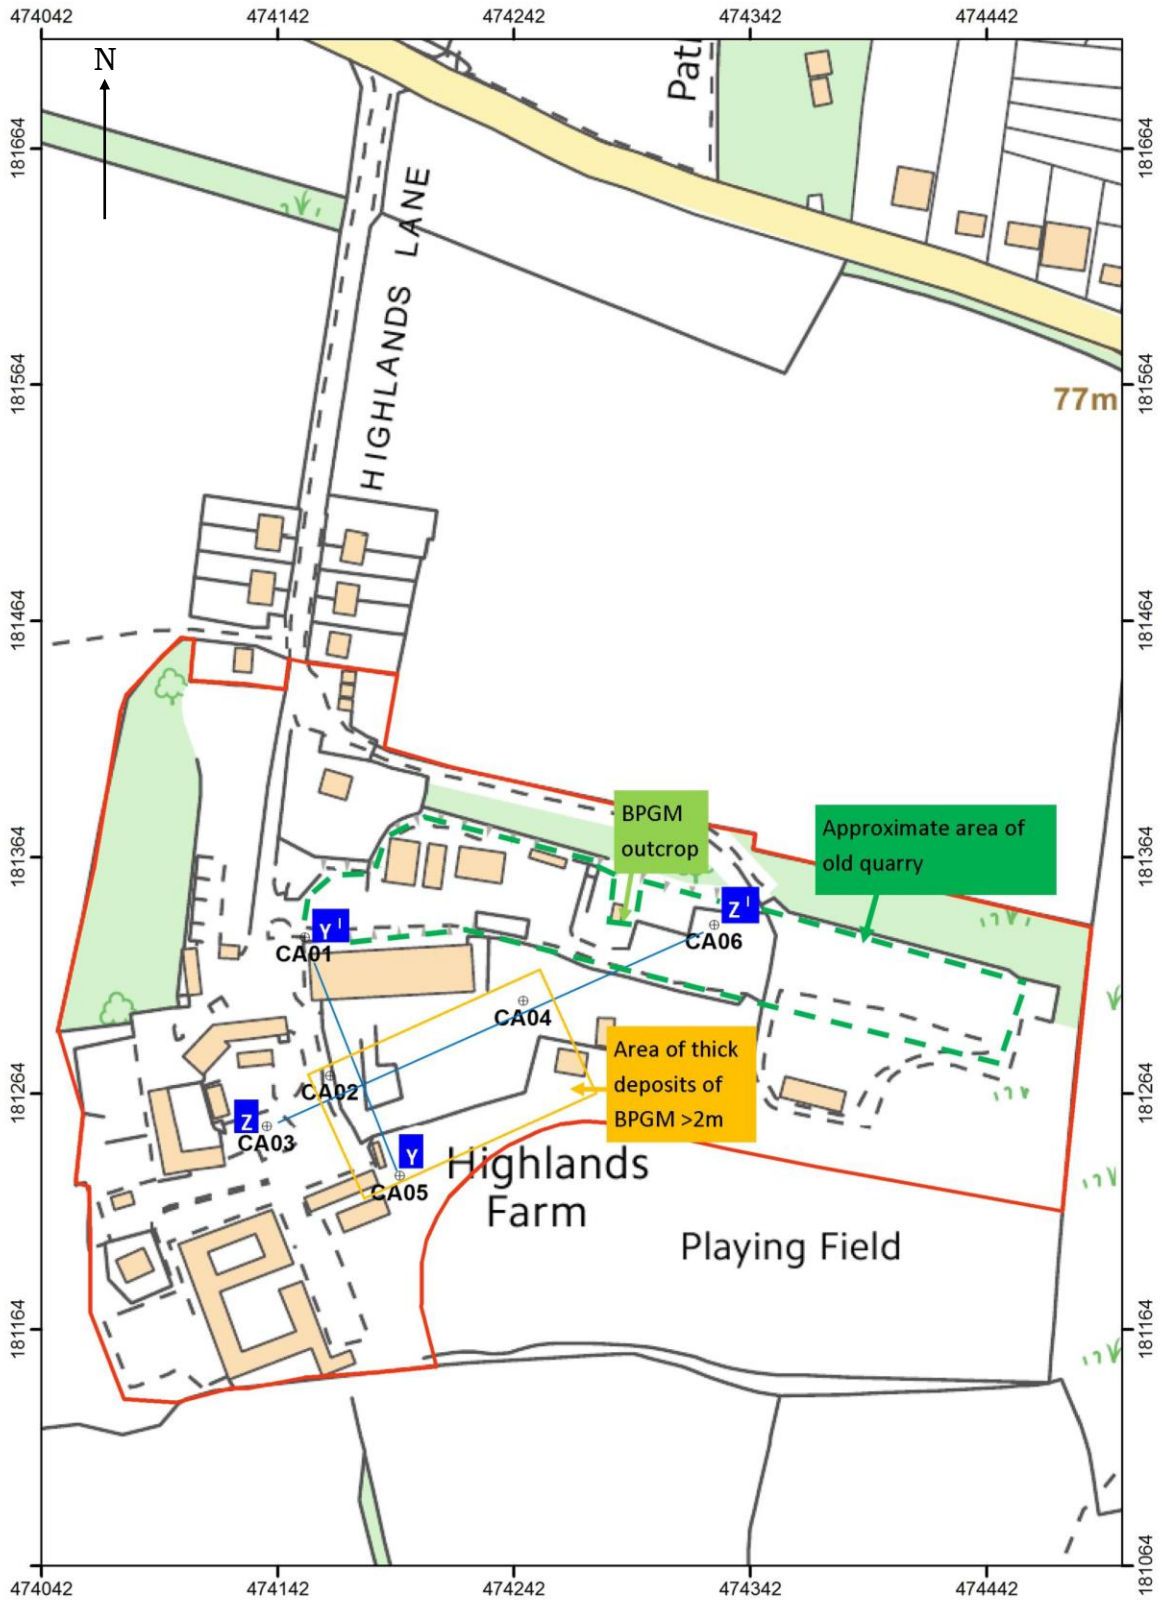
Site plan. Borehole locations CA01-CA06. Sections Y-Y' and Z-Z'. Site boundary in red.
